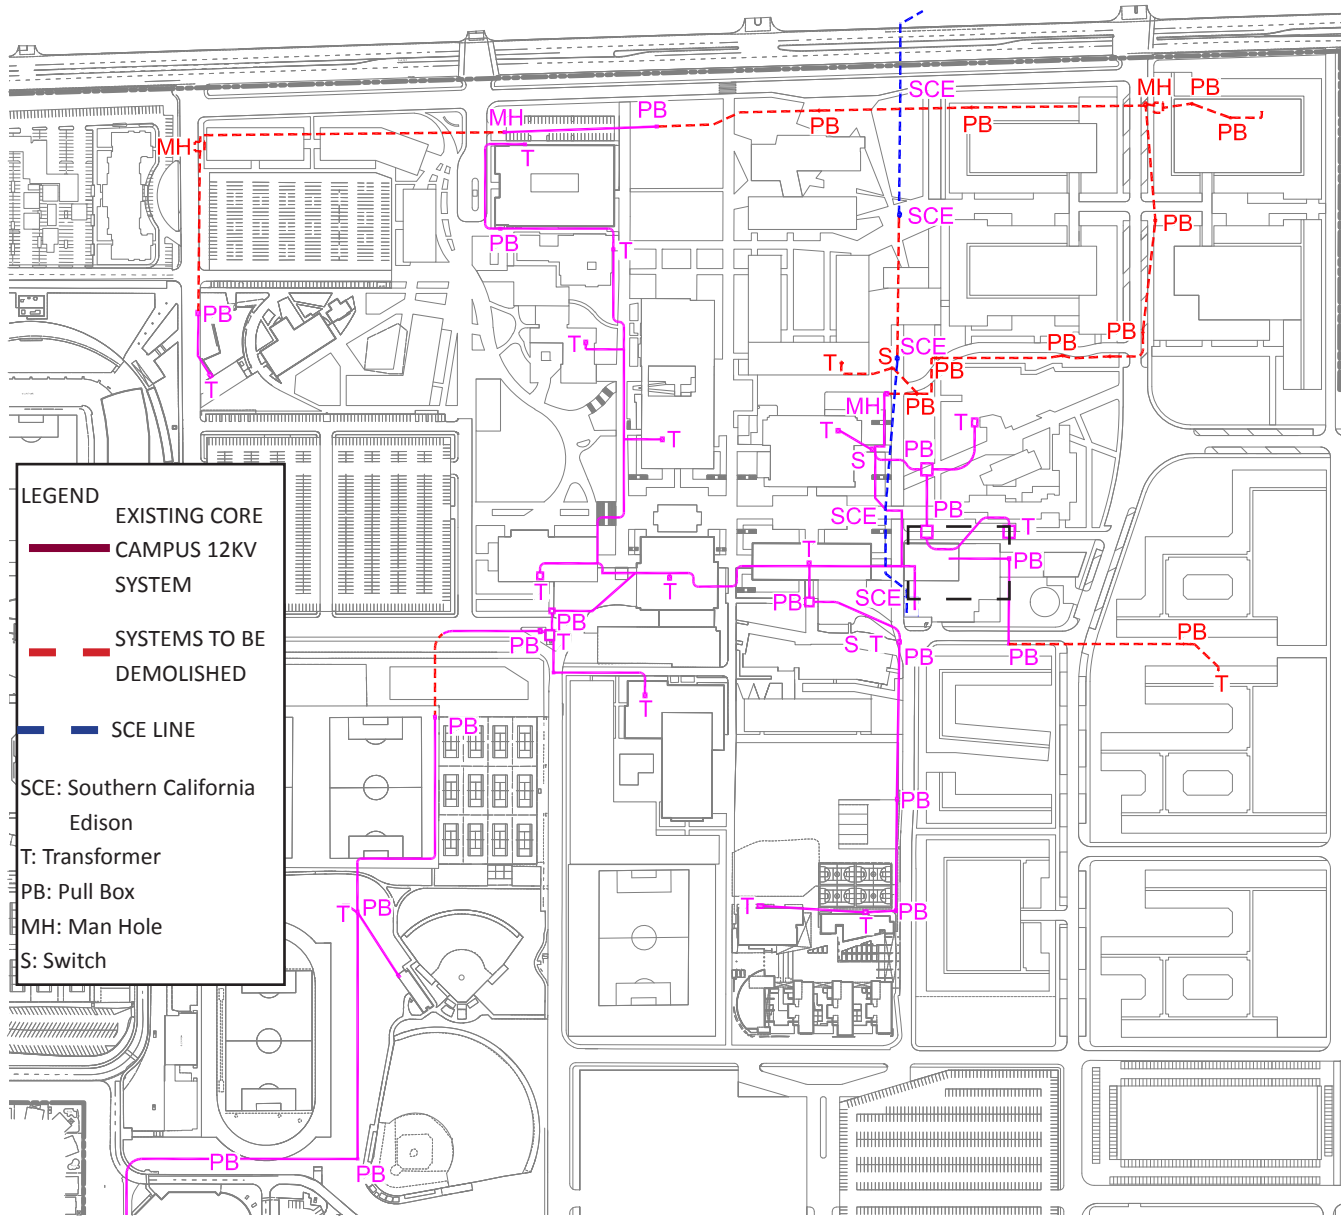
EXISTING 12KV POWER DISTRIBUTION LAYOUT, DEMO PLAN
